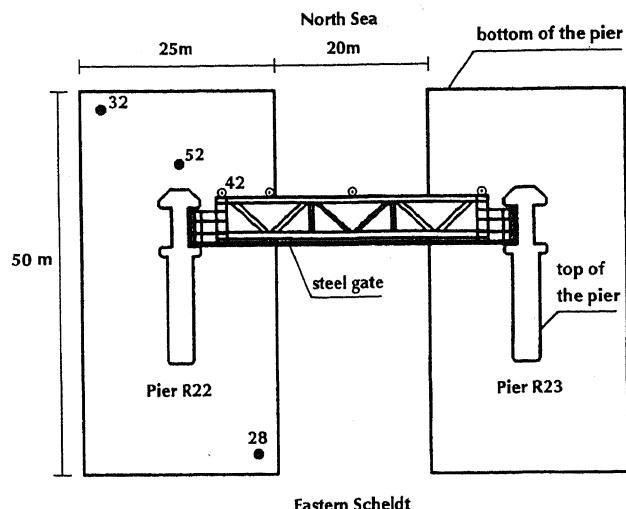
Position of wave measuring instrument 42 and piezometers 32, 28 and 52 in plan view
